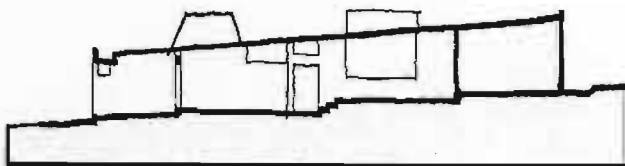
P. Mikula – House Shoba (1968). Section.
